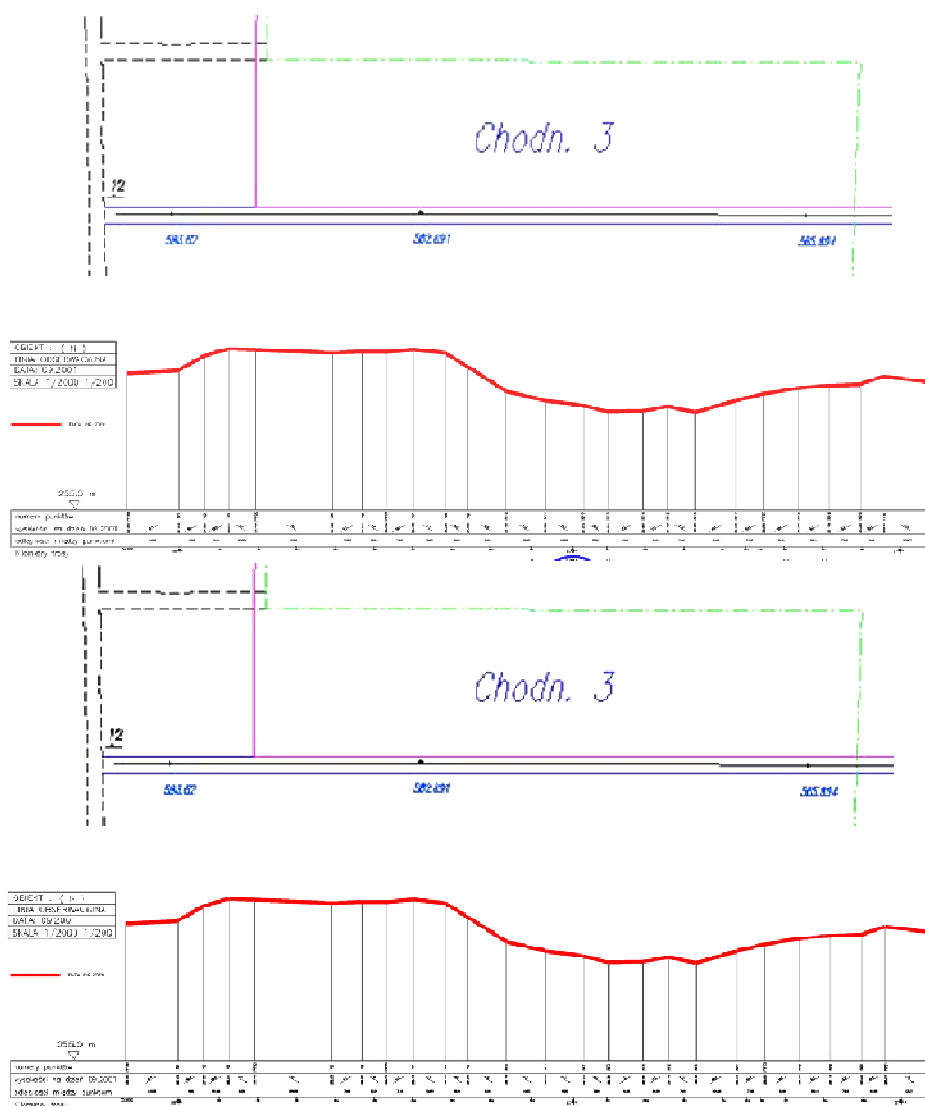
Longitudinal profile of the planned walkway generated automatically in order of the data about the deposit elevation
